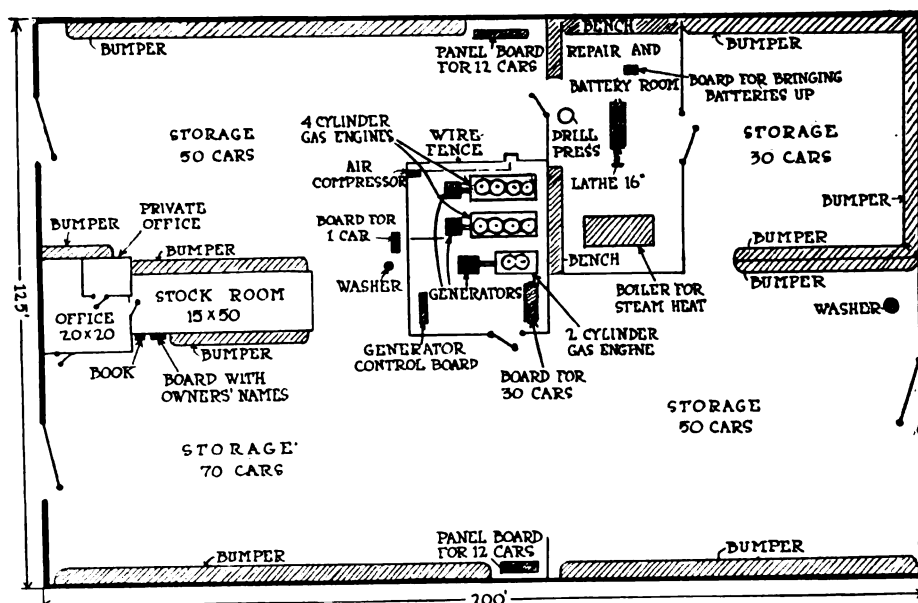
Floor plan of the Rudd electric garage, giving layout of electric generating plant and other departments
